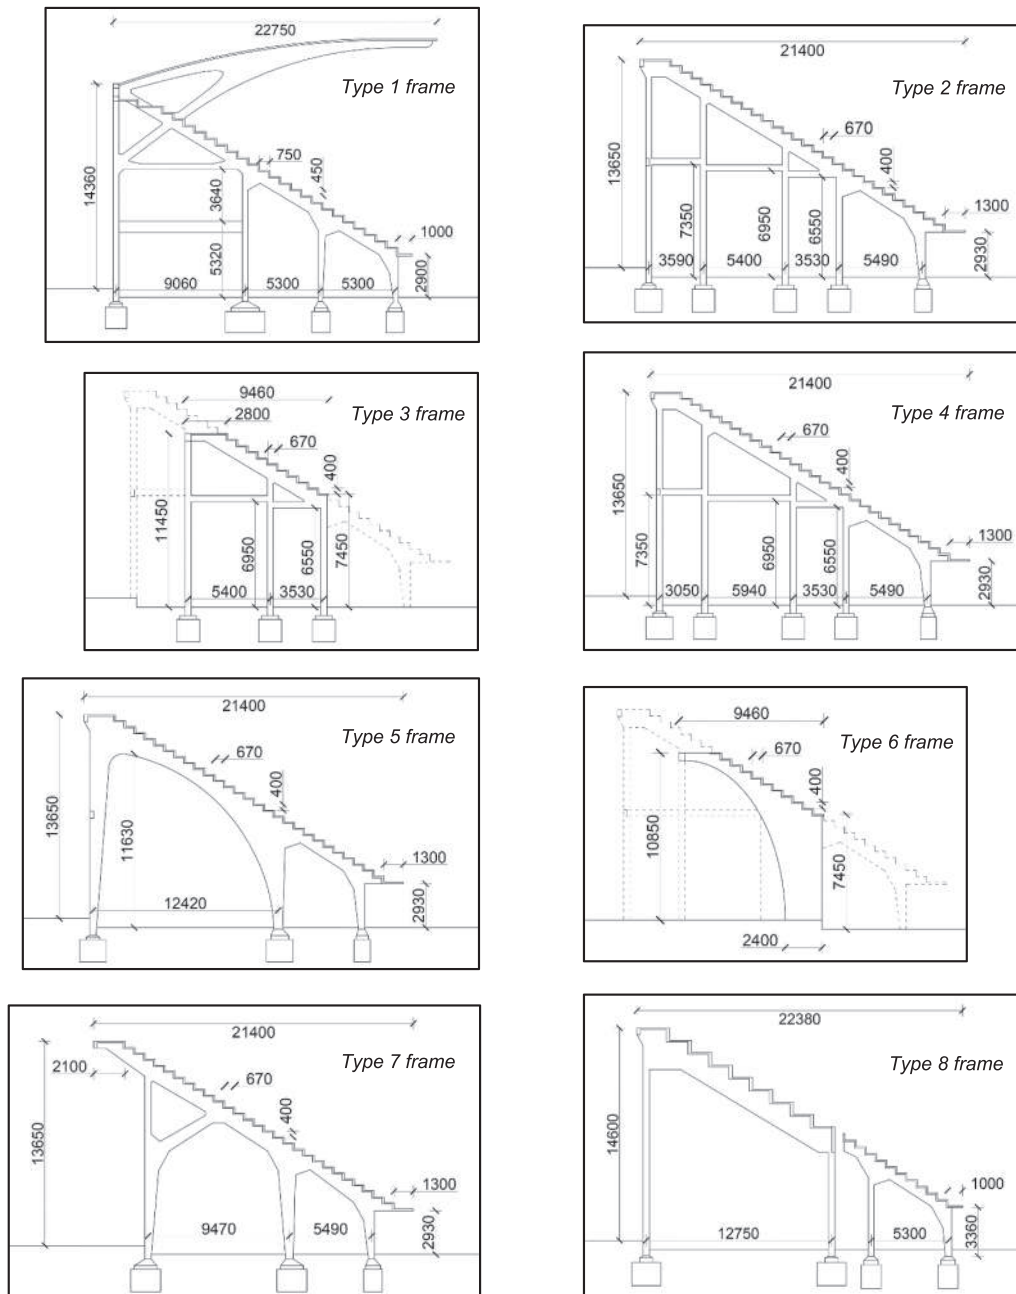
Geometry of the eight types of frames (dimensions in millimeters).
